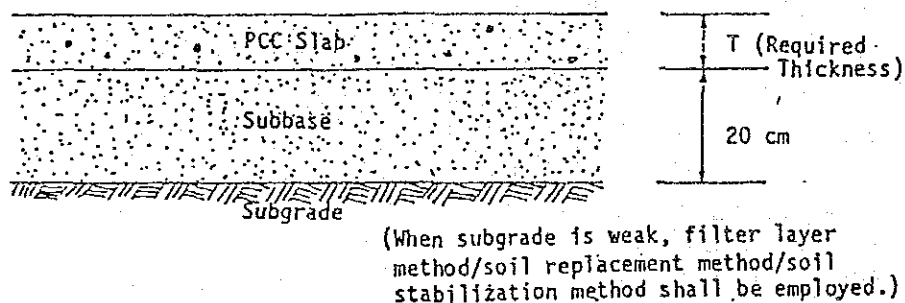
TYPICAL CROSS SECTION OF PCC PAVEMENT
